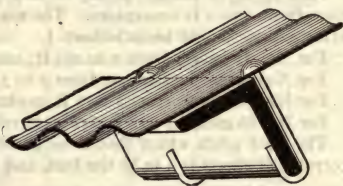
Sheets Fastened to Angle-purlin by Clinch-nails
